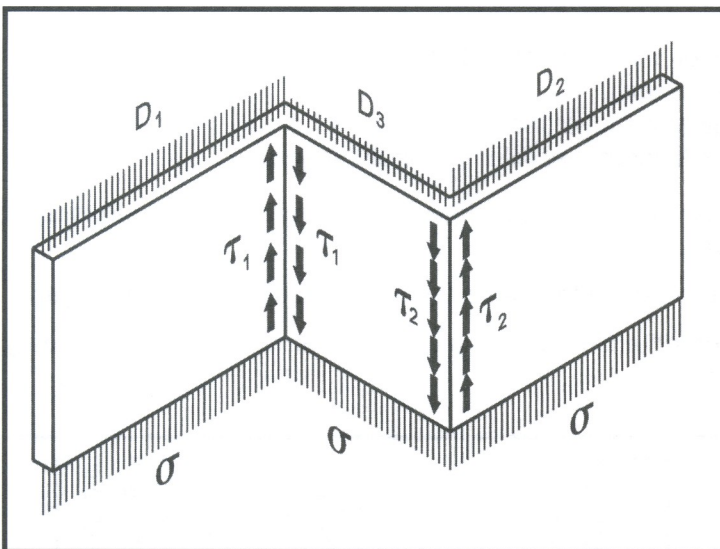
Normal And Shear Stresses In Wall Subjected To Non-uniform Vertical Load
